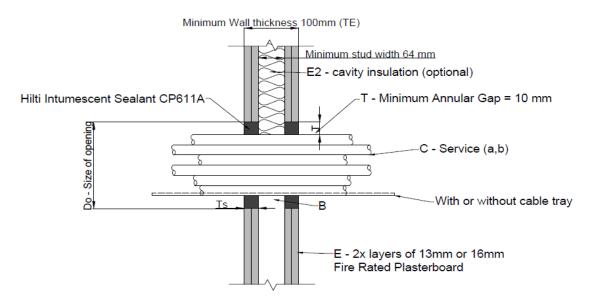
AS 1530.4:2014 D2 Standard Cable Sets, Side View of Seal Type 4, Refer to Table 9
